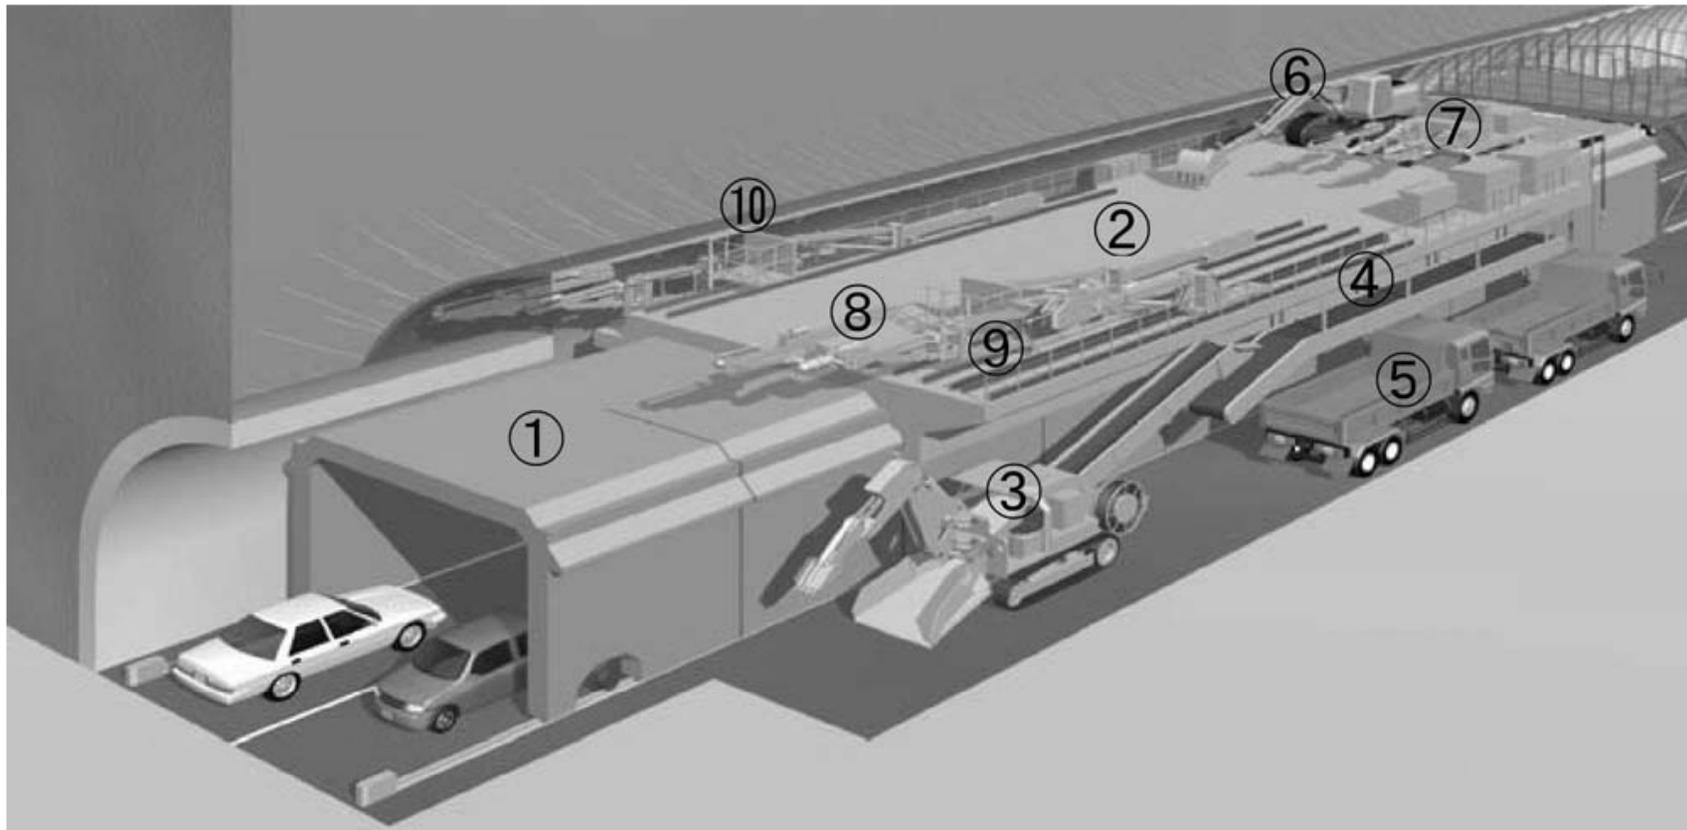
Napoleon Hat Type Staged Method; 1) Movable Shield; 2) Sliding TWS; 3) Muck Loader; 4) Belt Conveyor; 5) Dump Trucks; 6) Back-Hoe Excavator; 7) Boom Jumbos; 8) Drilling Unit; 9) Rails; and 10) Cage For Shotcrete (Reference 1)
